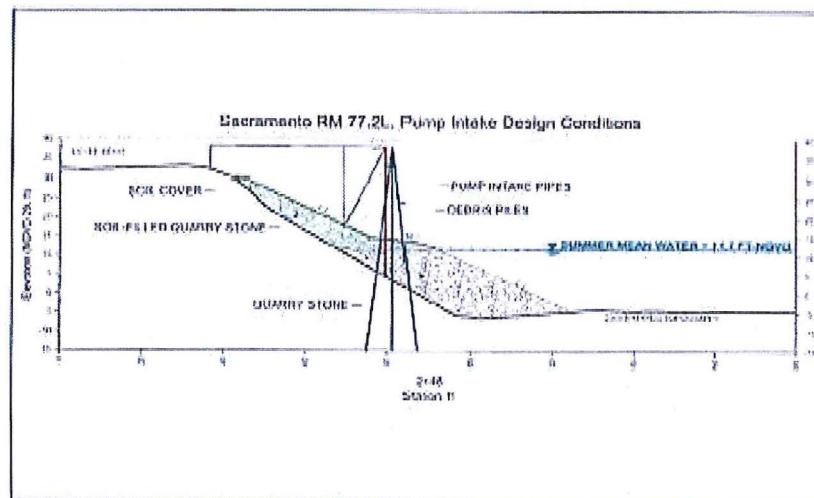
Design conditions cross section at SAC RM 77.2L at the pump structure location.
